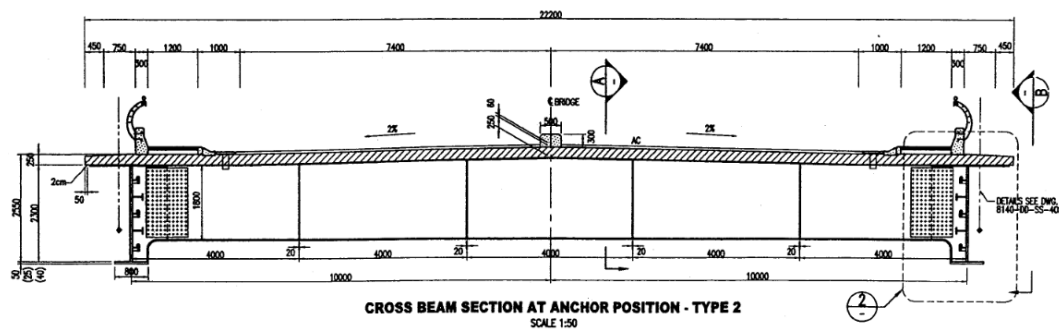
Geometry of the main girder and cross beam of the cable-stayed bridge structure
